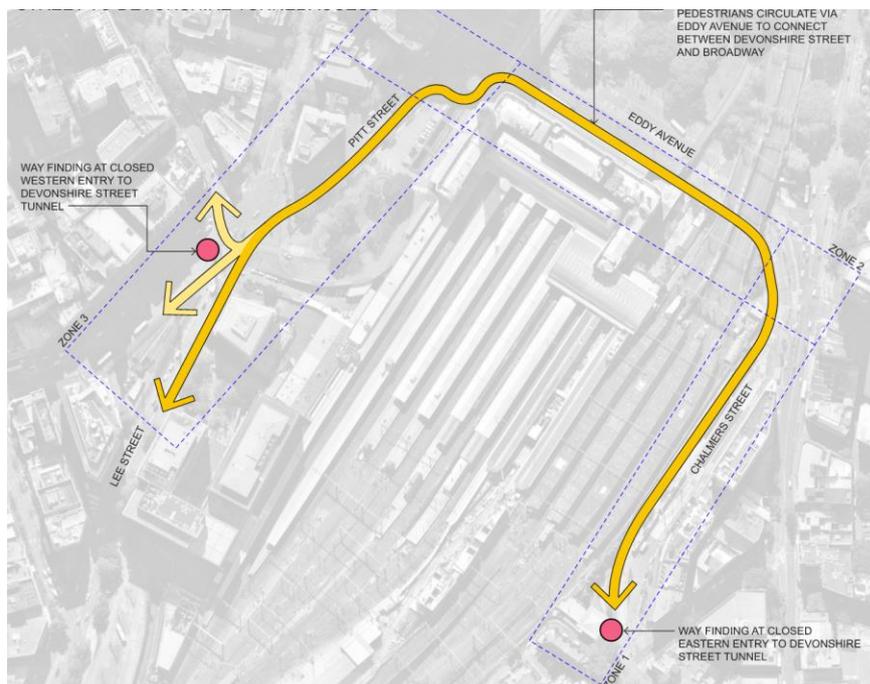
Option 2: Site setup and pedestrian access construction (Construction)
